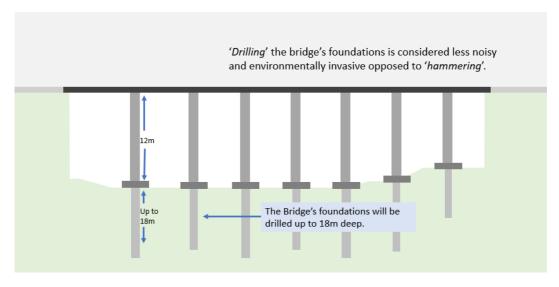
Artist's impression of new Mount Crosby Vehicle Bridge piers
